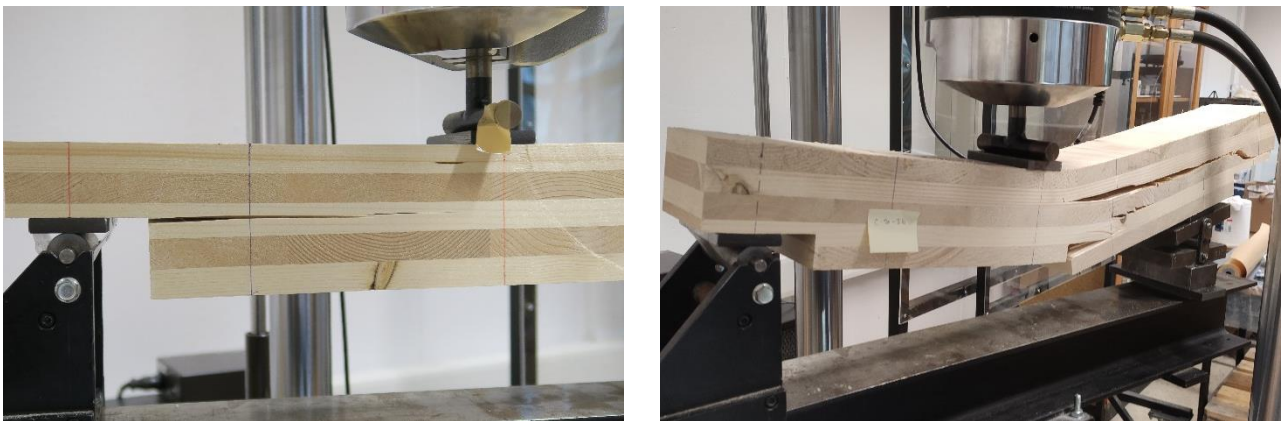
Left: Example of cracking at notch corner for a specimen in series E. Right: Example of specimen from series C only possible to test in one end. Due to the severe cracking when testing the first end, failure at the notch was not achieved when testing the second end.
